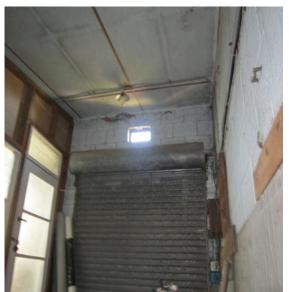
Internal layout of east section showing plasterboard cladding and internal masonry wall.
